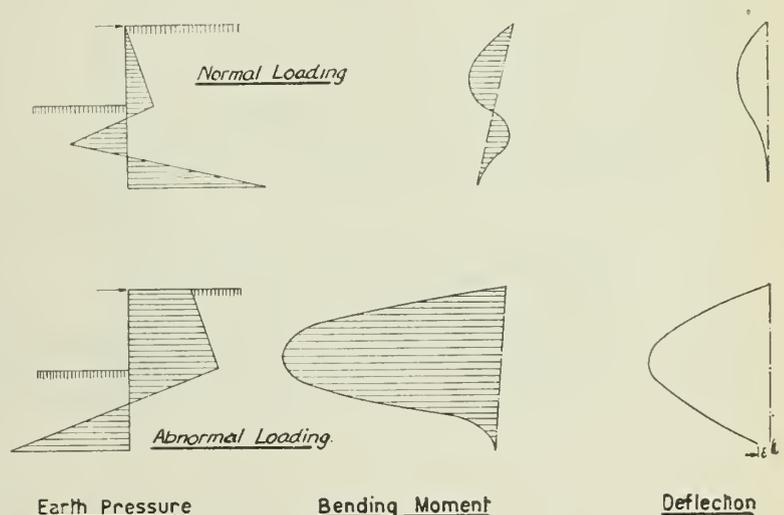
Effect of Over-Loading a Steel Pile Wall.
